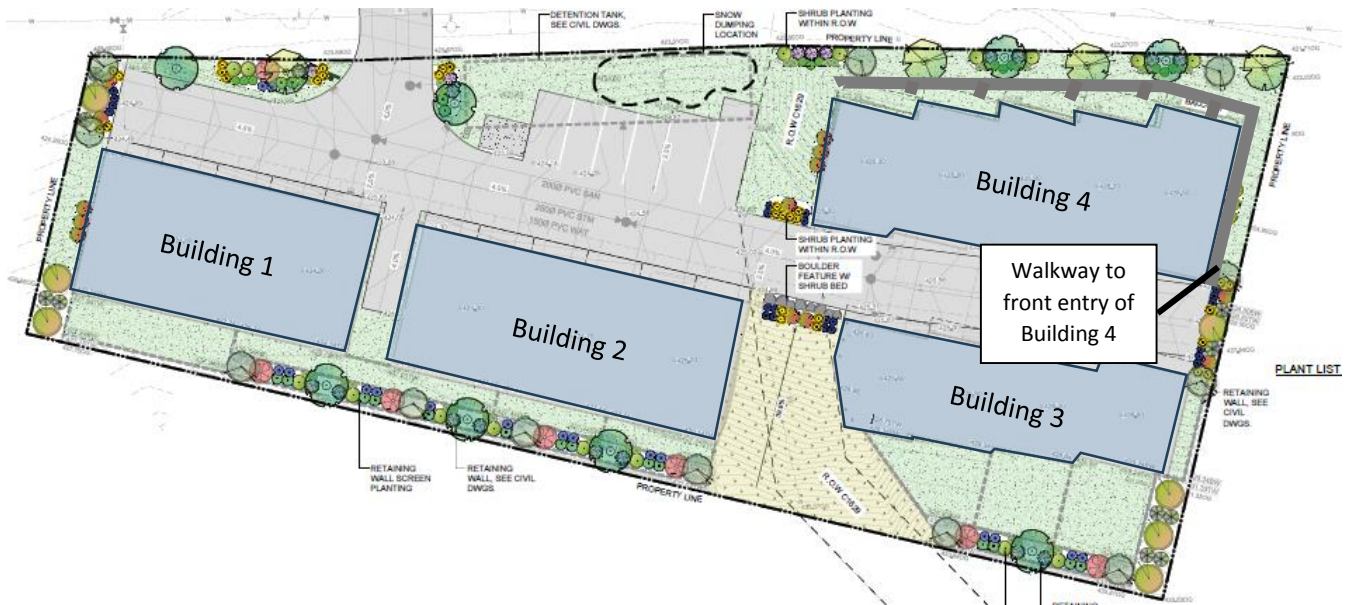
Landscape plan showing development concentrated on the west side of the site to conform and integrate with hillside topography / surrounding landscape and promote additional planting and landscaping along the streetscape frontage. There are 4 buildings total each numbered 1 through 4.
